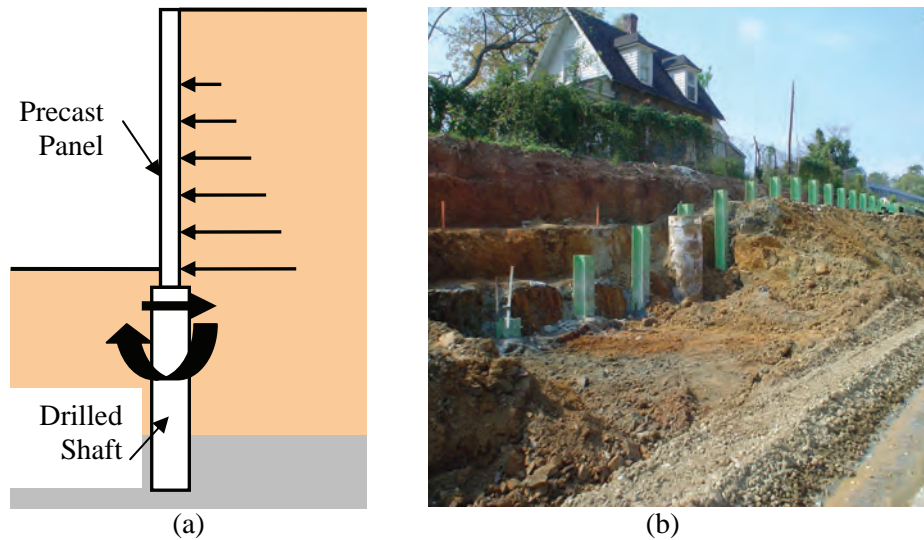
Drilled Shaft Foundation for a Retaining Wall using Soldier Piles and Precast Panels
